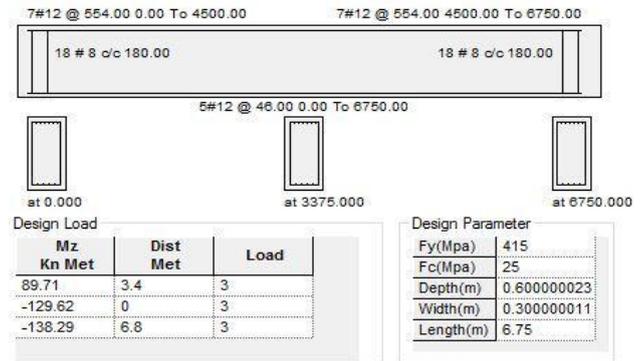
; Reinforcement details for beam No.412 in STAAD Pro. Using design code IS- 456:2000
